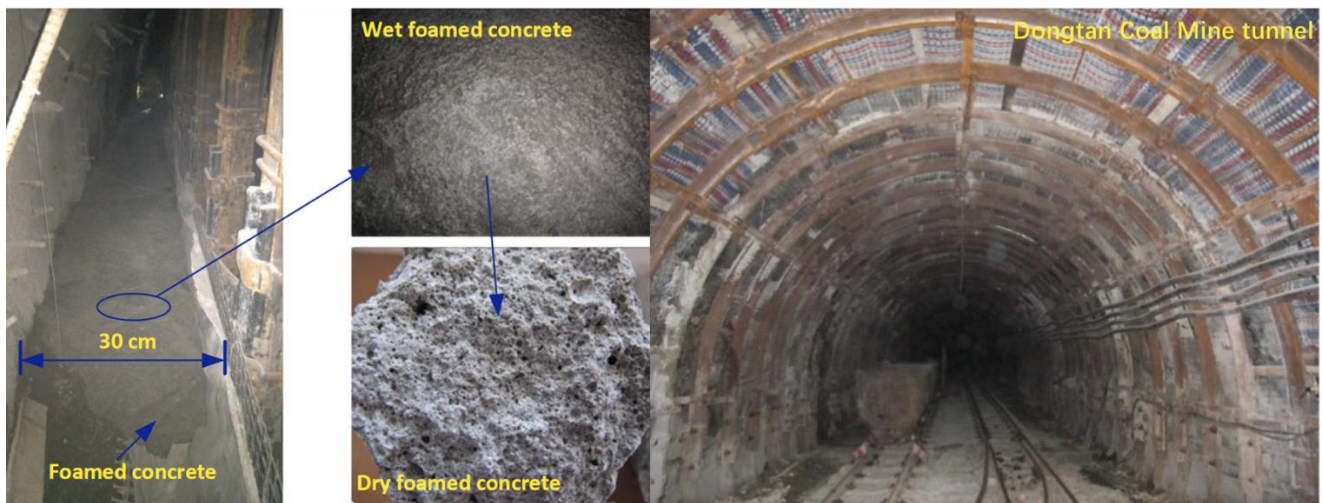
Applications of foamed concrete in the Duntan Tunnel [128].
